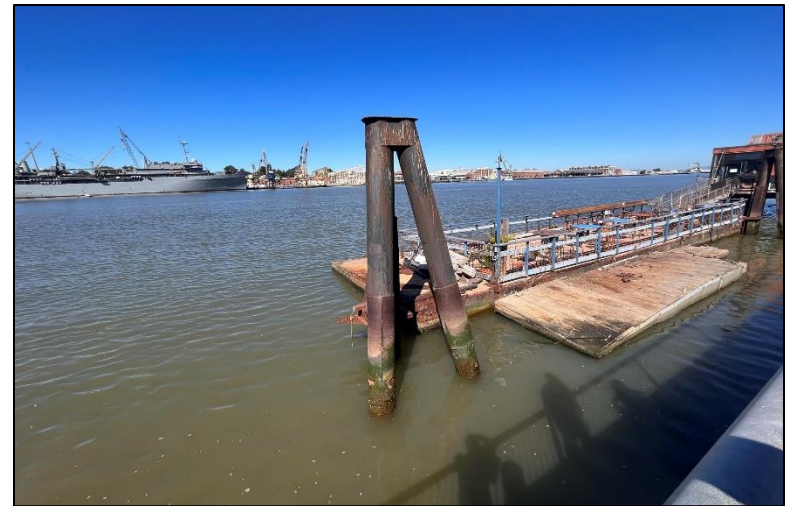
Existing ferry terminal infrastructure. Photo taken on July 25, 2023 facing west towards the Napa River.
